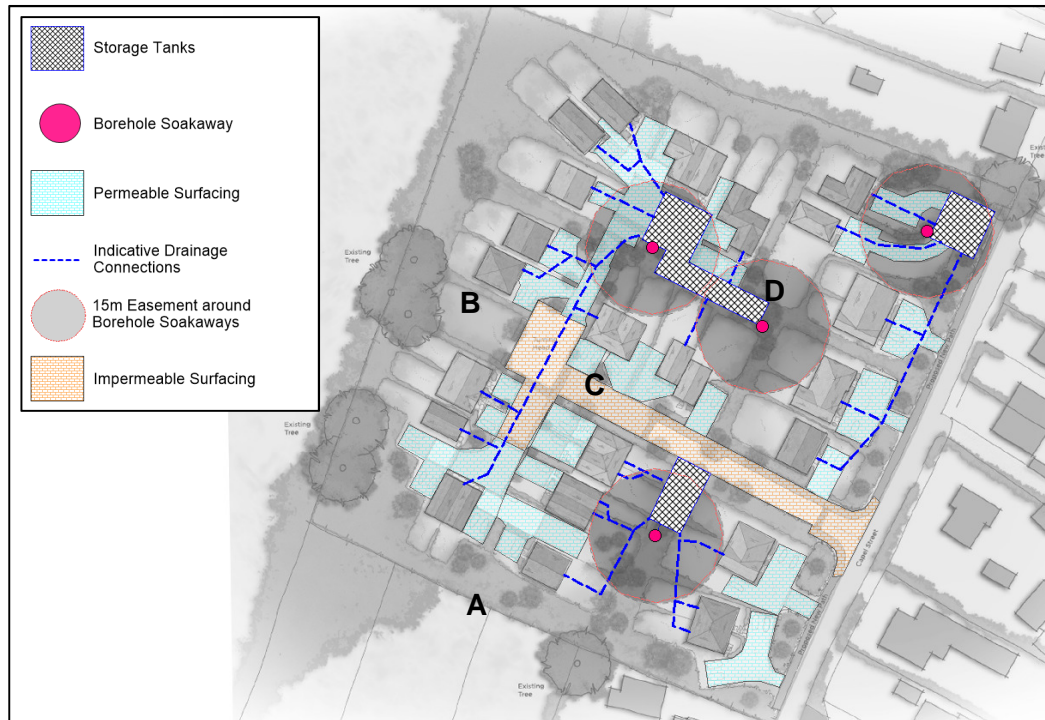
Indicative drainage layout plan showing the proposed location of SuDS.
